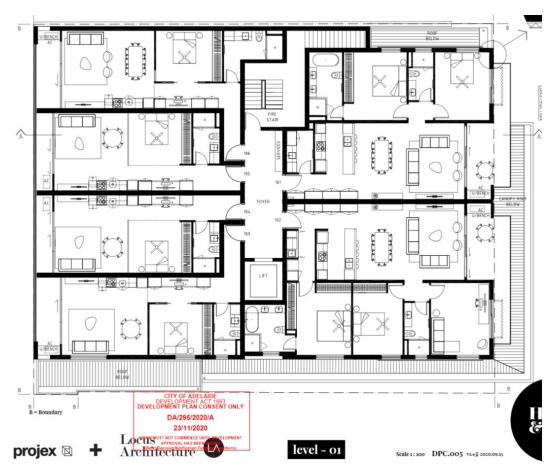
Approved Level 1 Floor in DA/295/2020/A
